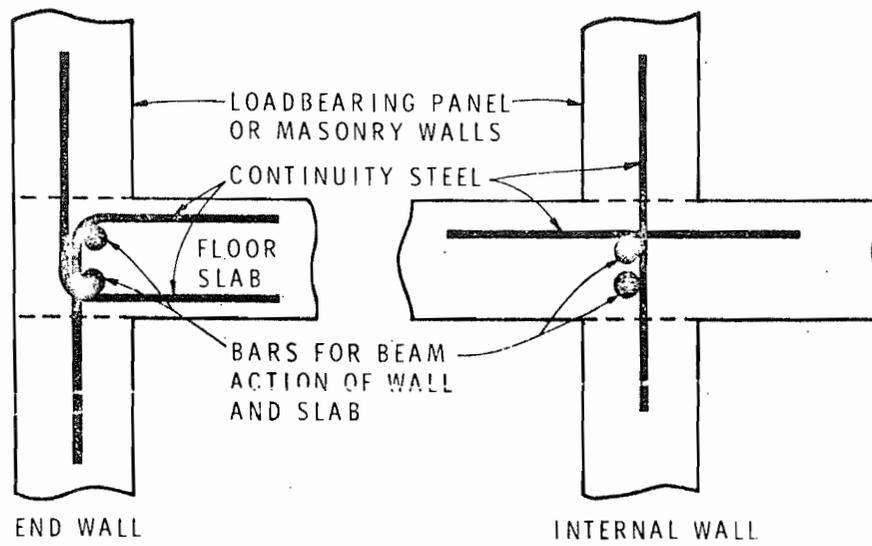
Idealized example of ductile connections showing continuity steel; longitudinal bars providing cantilever and beam action in walls are also shown. (Diagrammatic only.)
